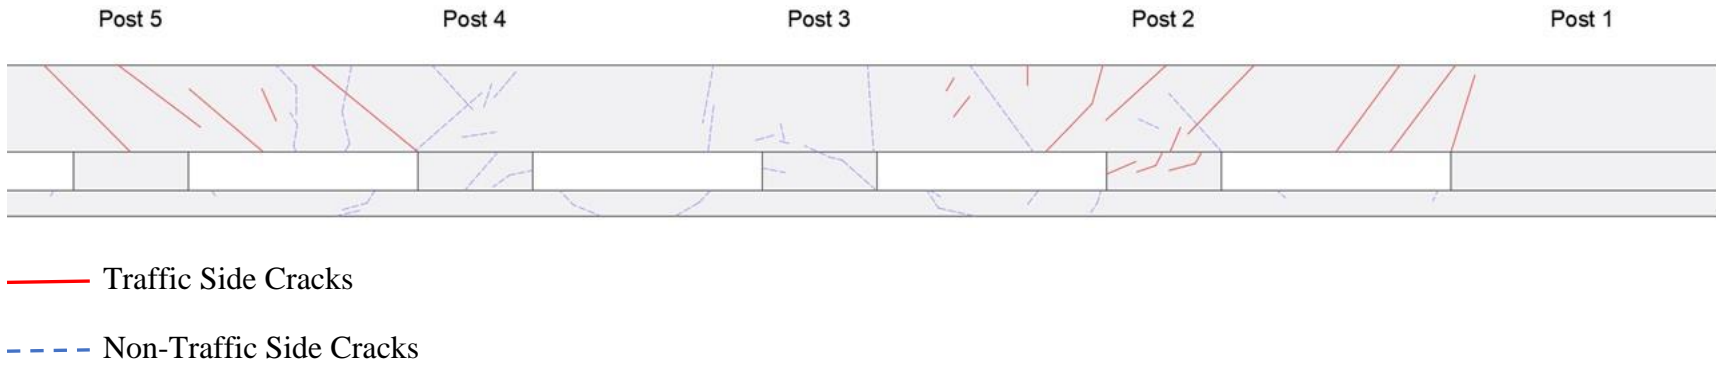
Schematic of Bridge Rail Cracks, Test No. OCBR-3
